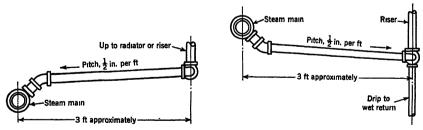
Typical Steam Runout where Fig. 3. Typical Steam Runout where Risers are Not Dripped Risers are Dripped
